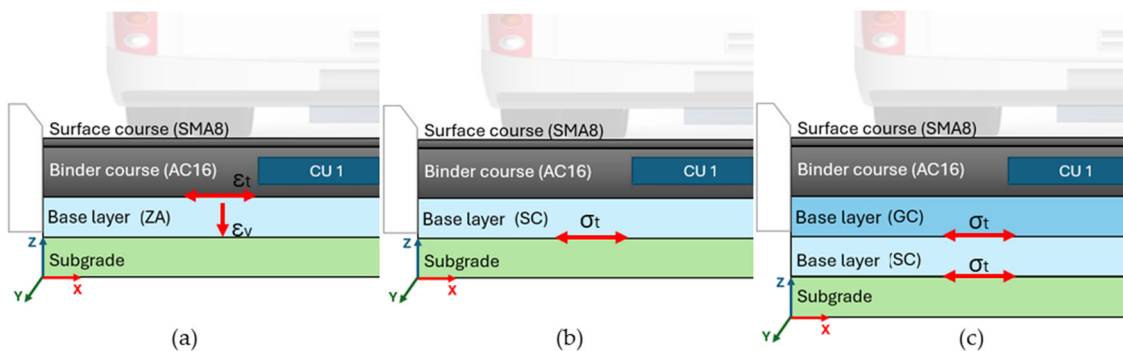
Interface conditions between pavement layers and CU: (a) flexible and semiflexible pavements; (b) semirigid pavement with SC; (c) semirigid pavement with GC and SC.
